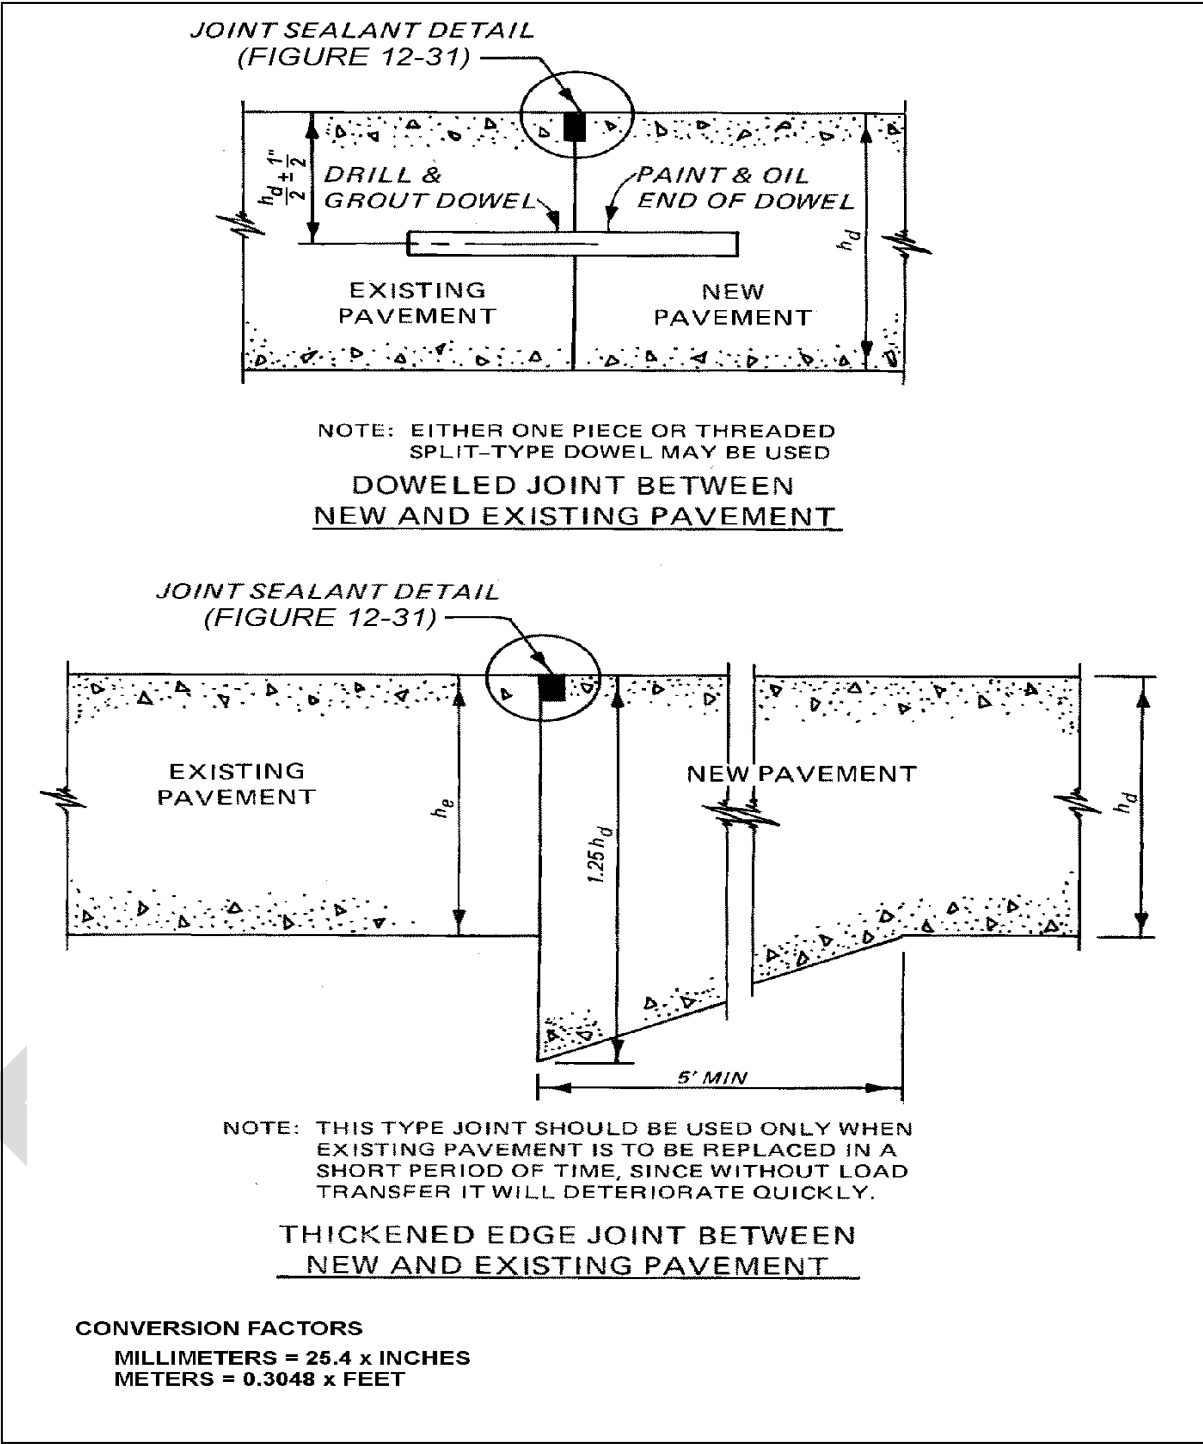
Construction Joints for Plain Concrete Pavements
